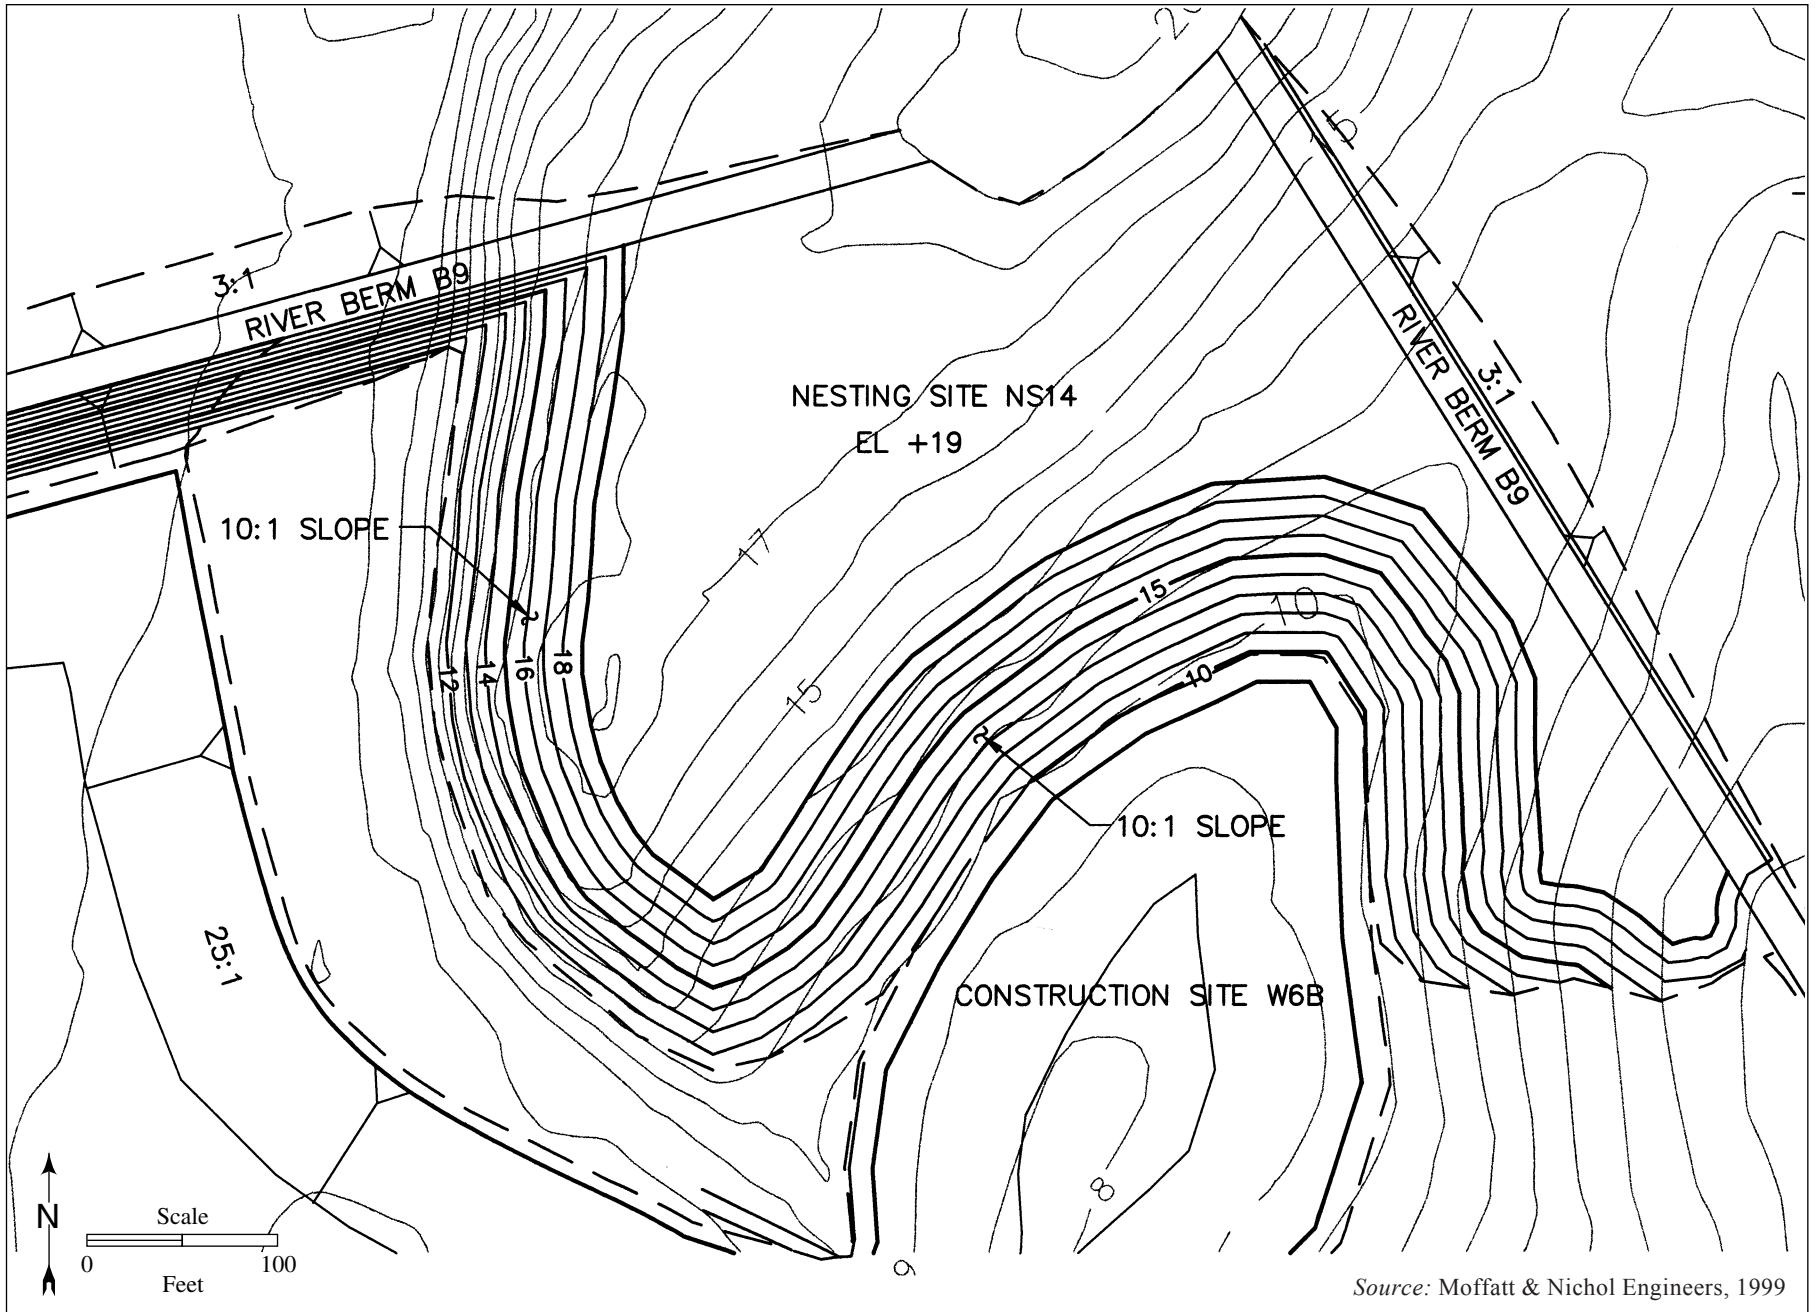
Nesting Site NS14 Grading Plan
